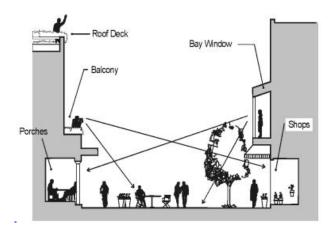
(E): Example of how building facades and the outdoor space complement each other. (The building facade has balconies, bay windows, decks, etc.)
